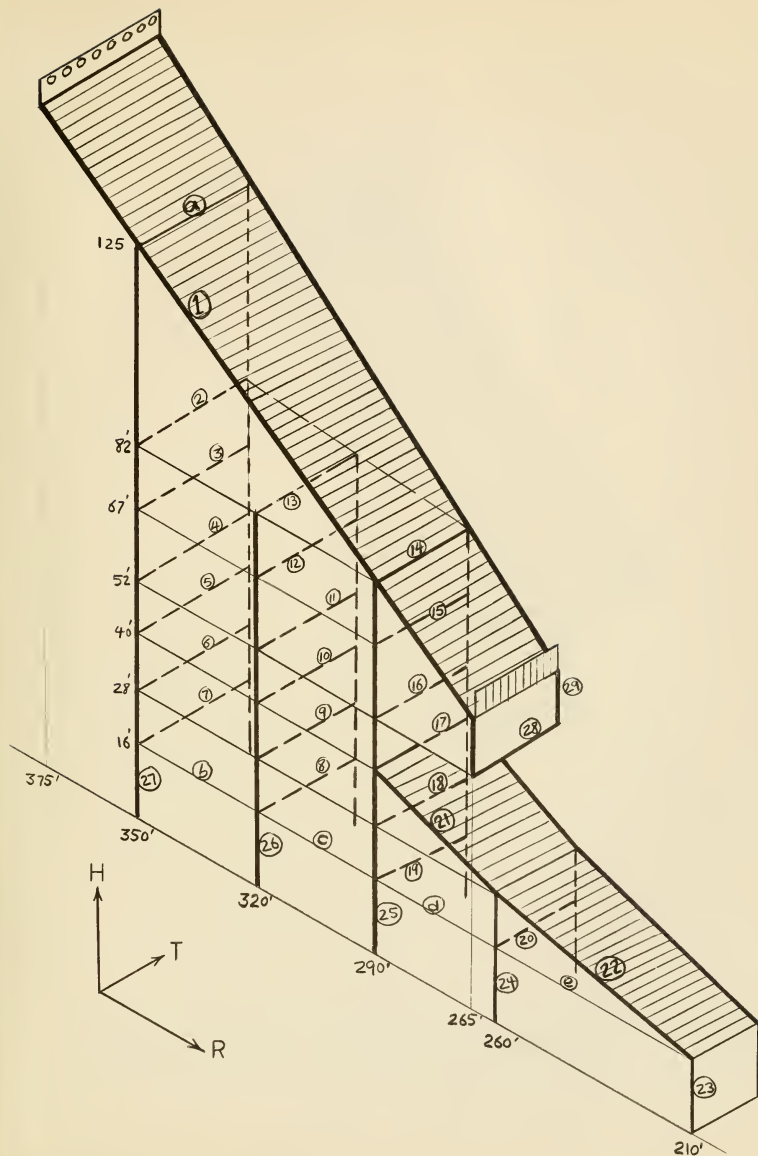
A TYPICAL SECTION BEHIND HOME PLATE.
